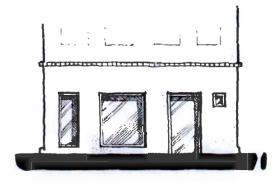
Ground level, street-facing facades shall have at least 50% clear glazing.
